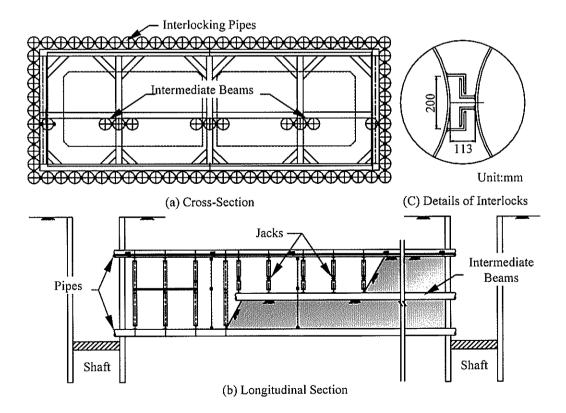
Tunneling in sections 3 and 4 of the Underpass
